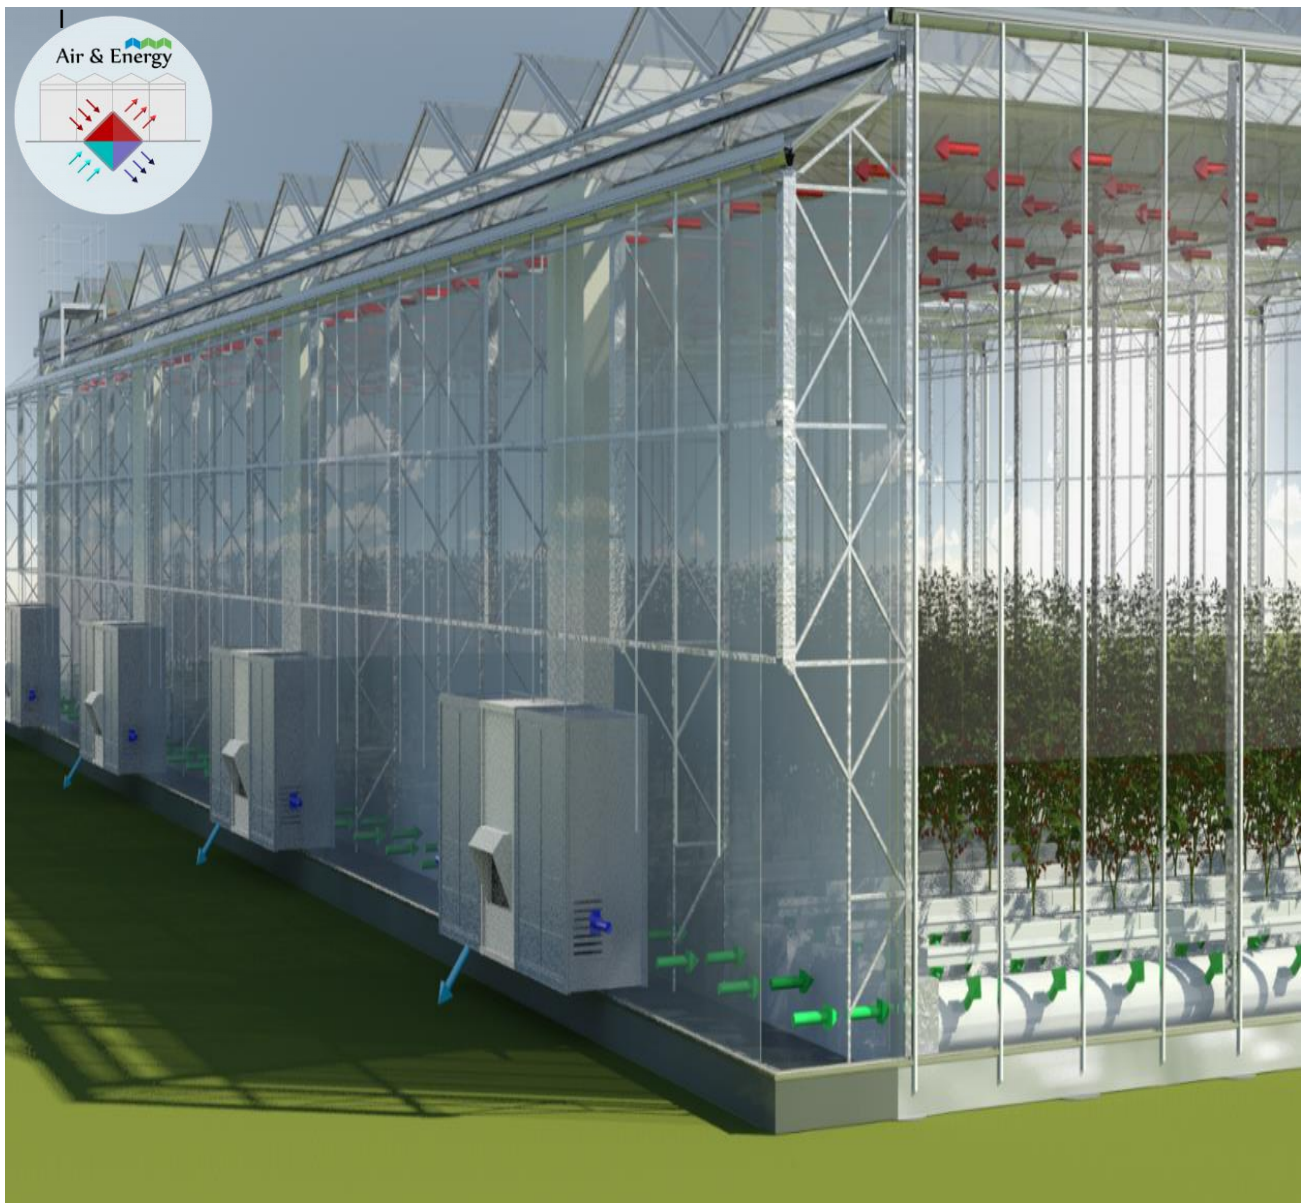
Ammerlaan Construction Design Semi-Closed Glasshouse (Source: www.glassconstructions.eu)
